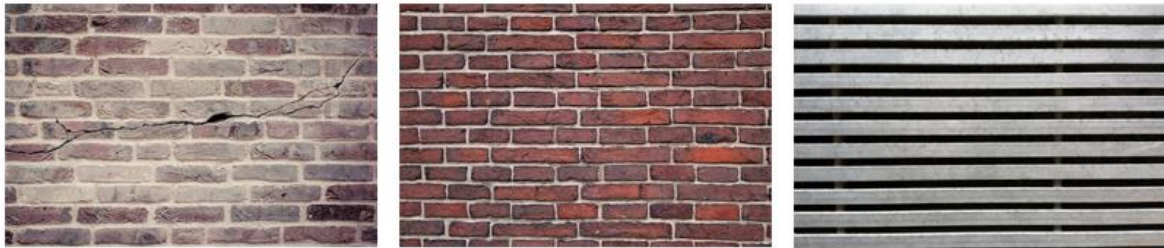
Wall types: 1. Brick Wall 2. Strong Brick Wall 3. Steel Wall [6]
